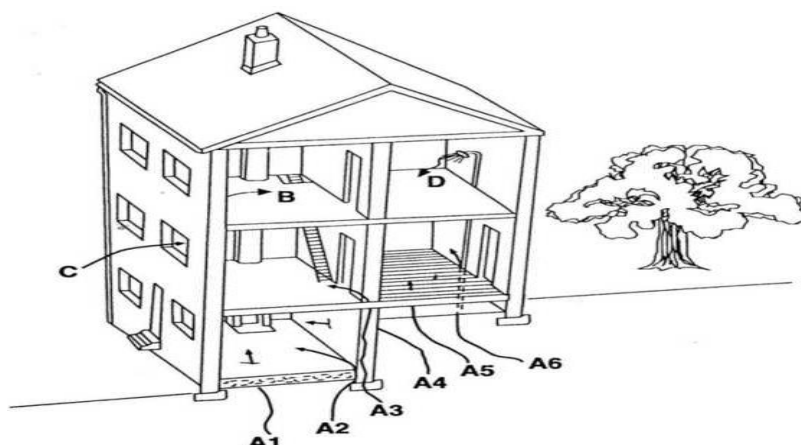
Typical Radon Source entry route. A1: Cracks in solid floors, A2: Cracks in joints, A3: Cracks and cavities in walls, A4: Cracks below ground level, A5: Gaps in suspended floors, A6: Gaps around service pipes, B: Emissions from building materials, C: Addition from outdoor air, D: Release from water. Source: Westside-Radonservices (2020).
